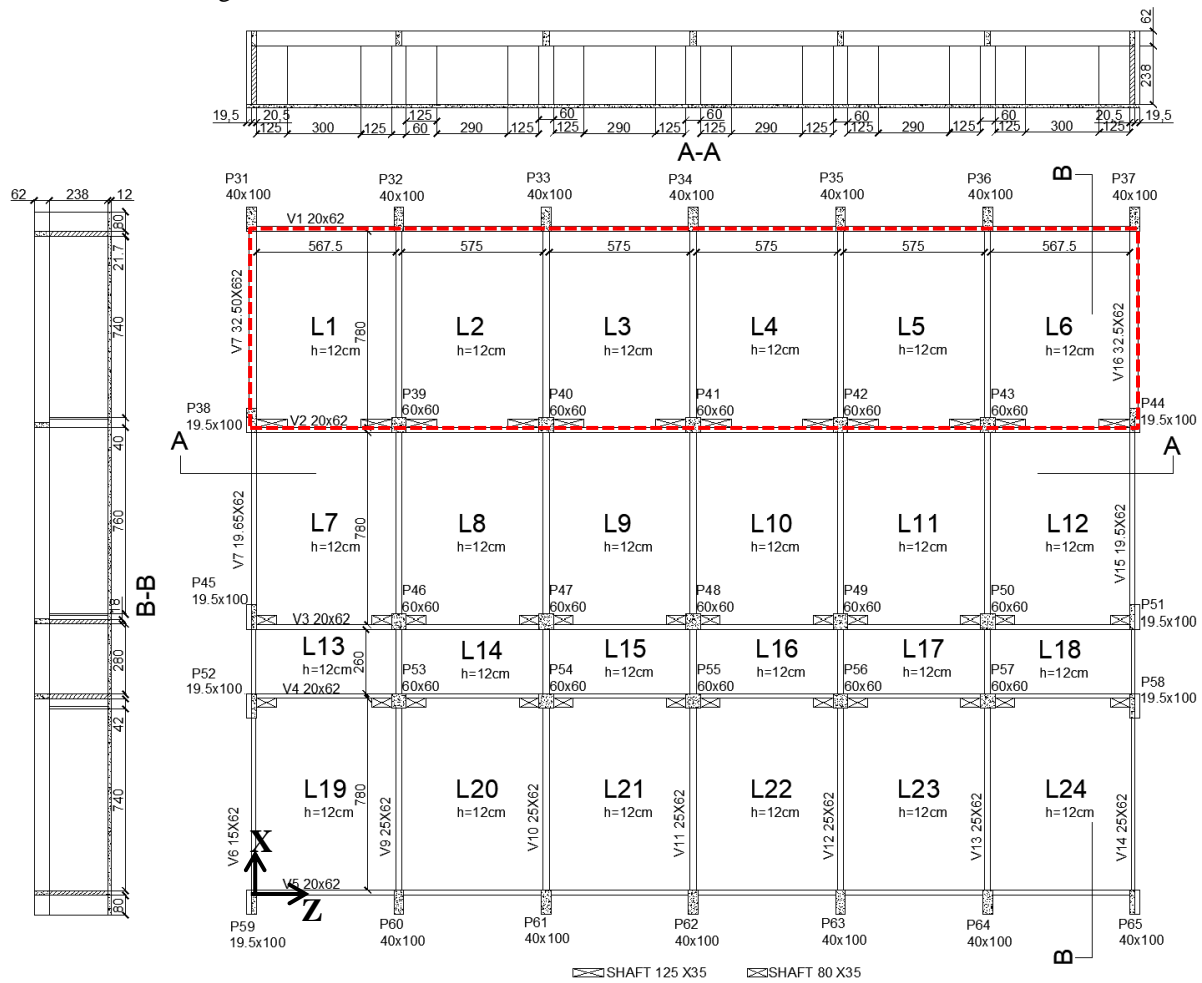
Reinforced concrete floor upper view (units in centimetres)
